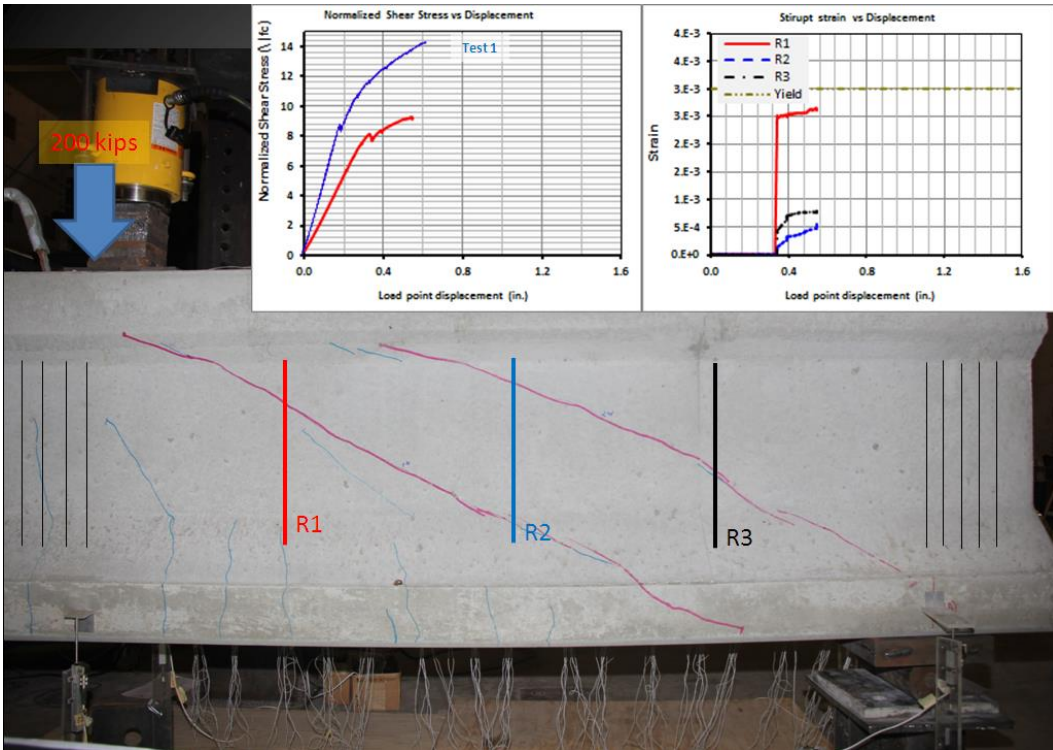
Girder 2-Test 2 flexural cracks
